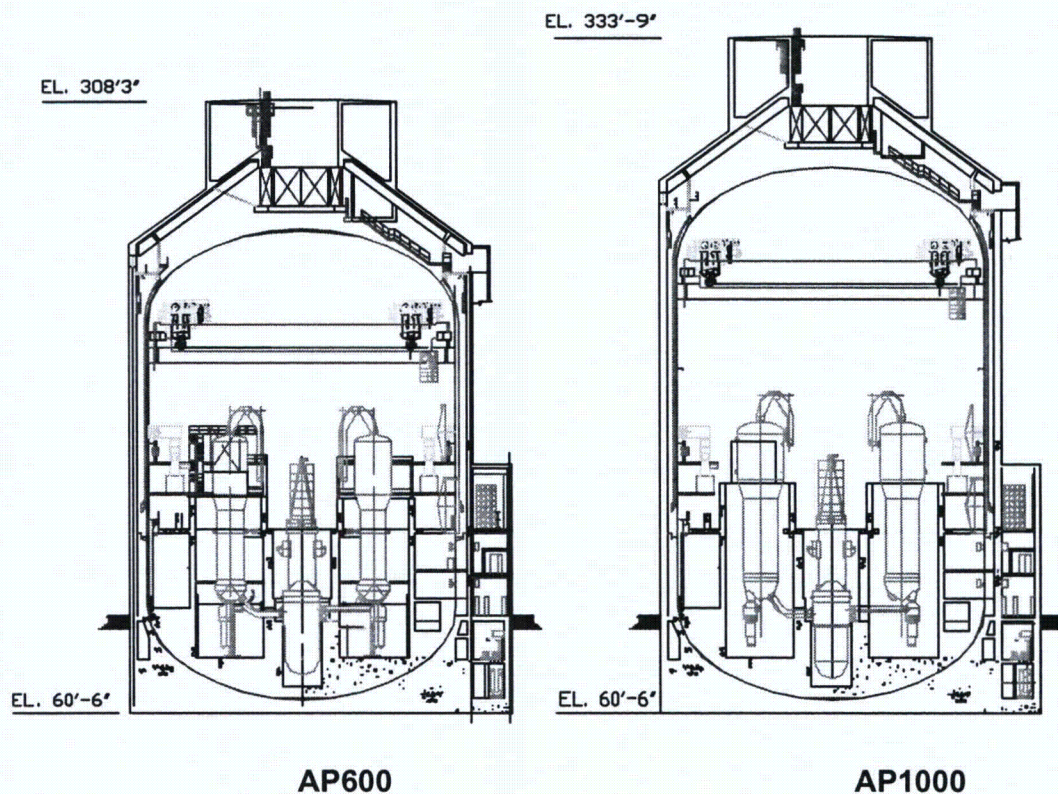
Westinghouse AP1000 and AP600 Plants (Section)
